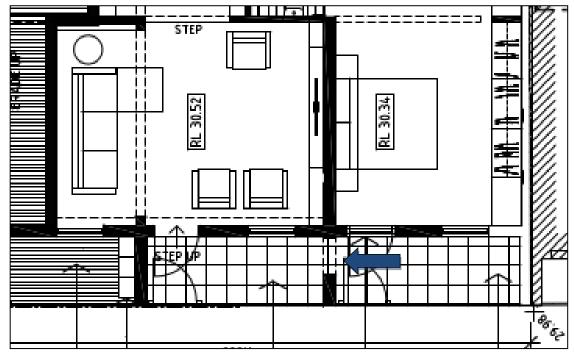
Ground level plan showing proposed demoliton to verandah party walls
